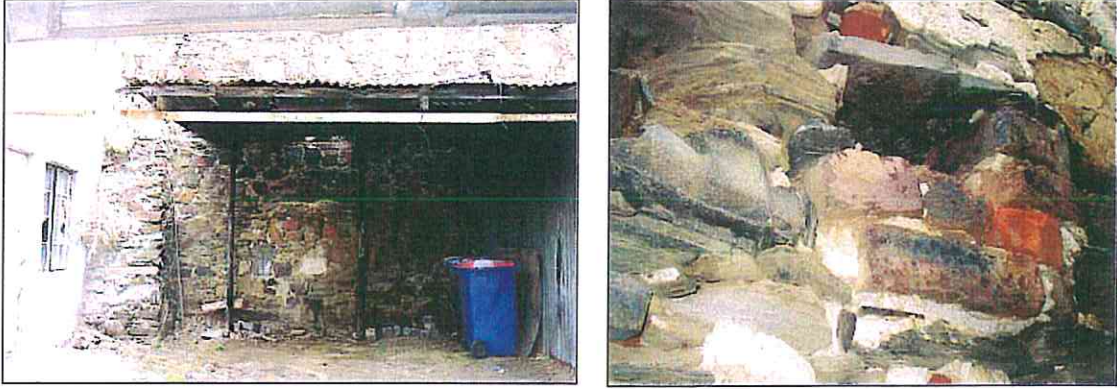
Backyard historic retention wall, buttress at the left, 150 Buitengracht, 2007. This 'bluestone' – slate wall seems to have been erected by the mid- 18th century. To the right detail of the wall construction, probably a hole for a beam, filled with late 19th century bricks. The plaster is of 18th century composition, indicating an inside wall(?).
